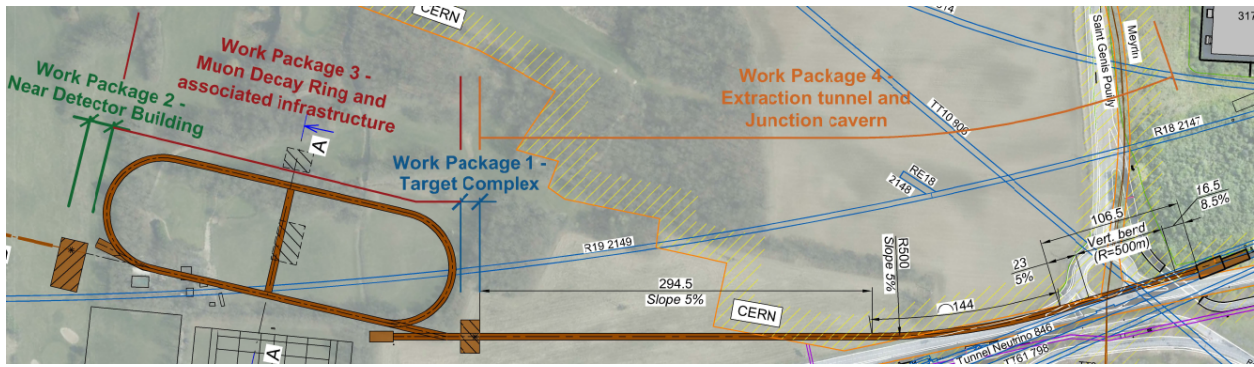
Plan showing proposed split and phasing of work packages during CE works.
